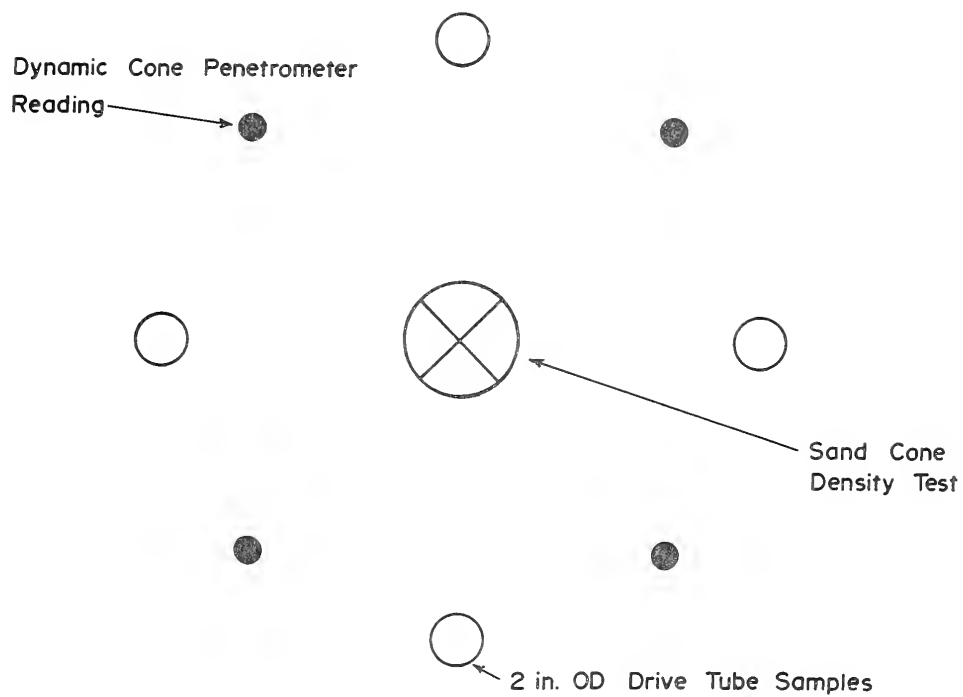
TESTING PLAN AT EACH LOCATION.
